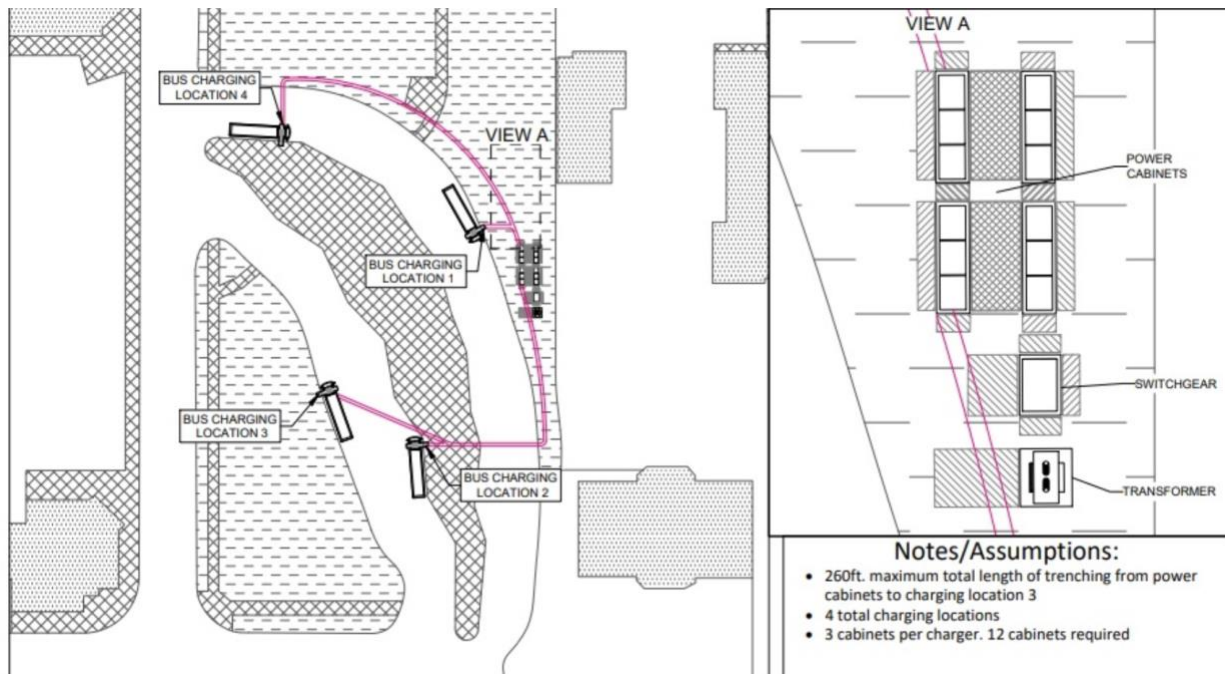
Installation Schematic for On-Route Charging at Lacey Transit Center
